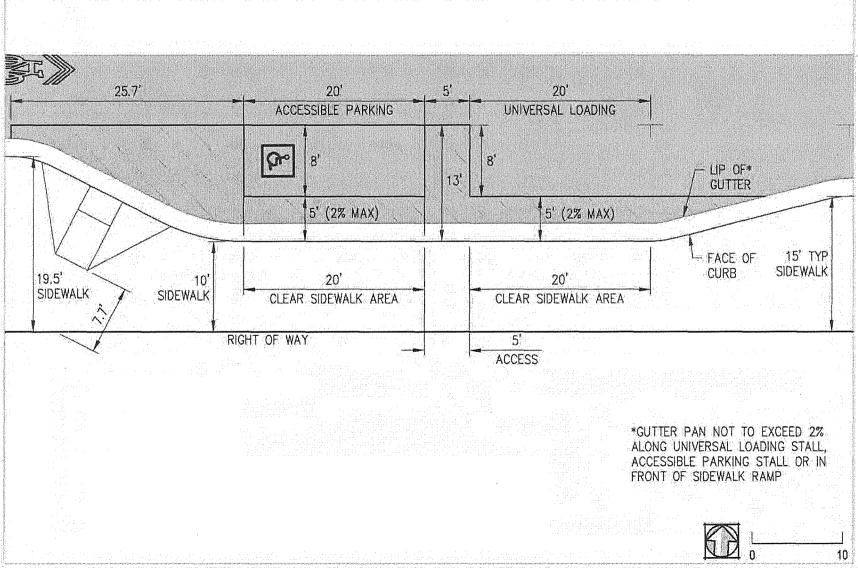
Typical Configuration of On-Street Universal Loading and Accessible Parking Stalls
